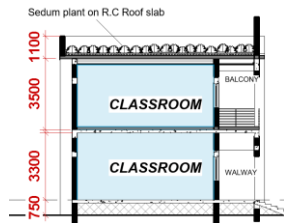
Section, showing the green roof on the RC Roof. (Source: MDG Projects, 2023)
